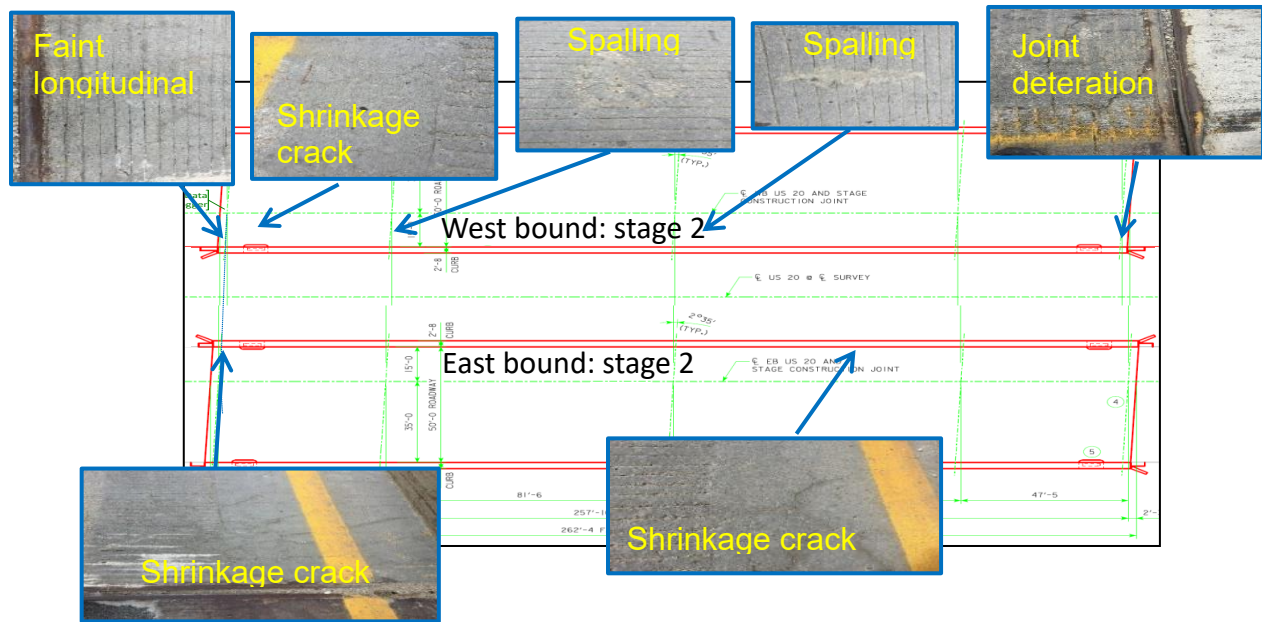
Crack survey results on the Stage 2 deck surface before new overlay construction
